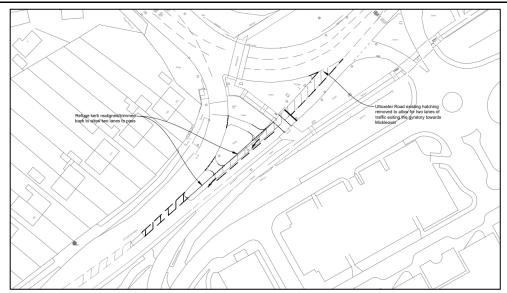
Proposed Additional Lane- Exit Arm Uttoxeter Road
